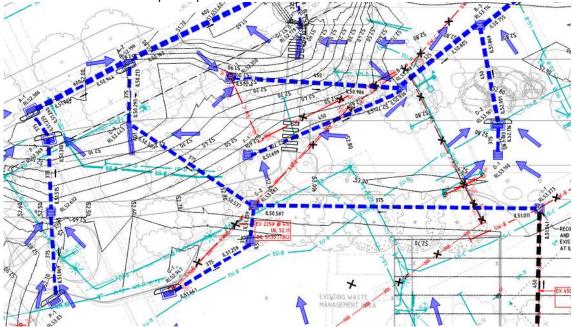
G: Diversion of existing stormwater lines from North Block
